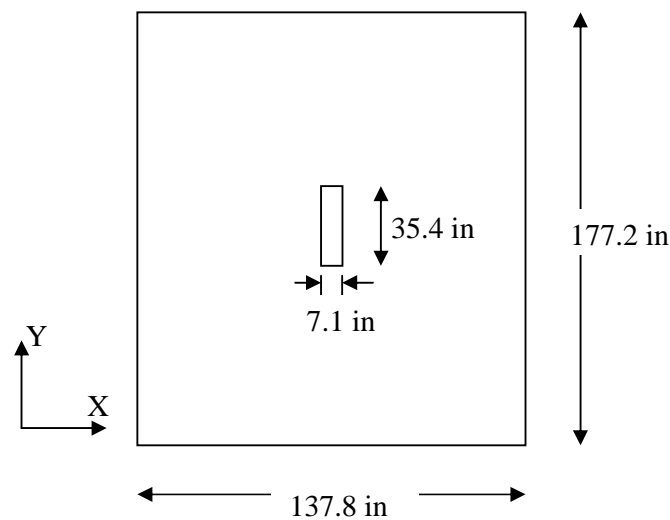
Plan view of 5.9 inch thick slab; (Tan and Teng)
